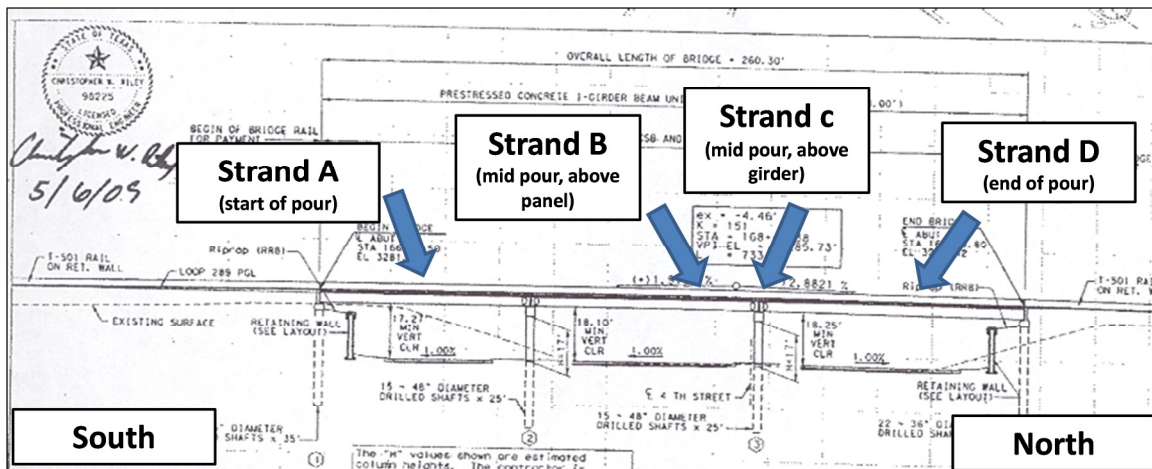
iButton strand layout for Lubbock bridge deck.
